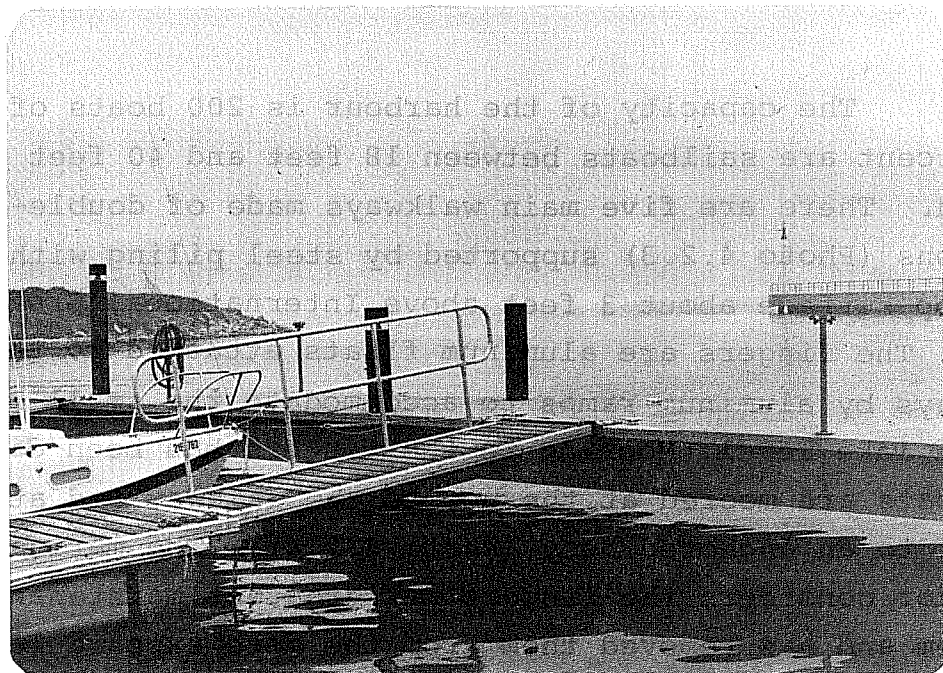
Fixed concrete walkways with floating aluminum fingers at Portsmouth Olympic Harbour.
